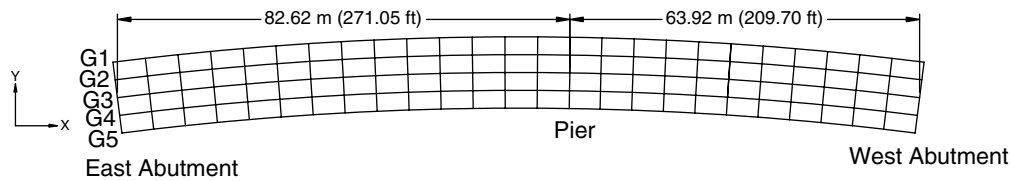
Structure 207 plan view; the z-axis is parallel to the girder webs
